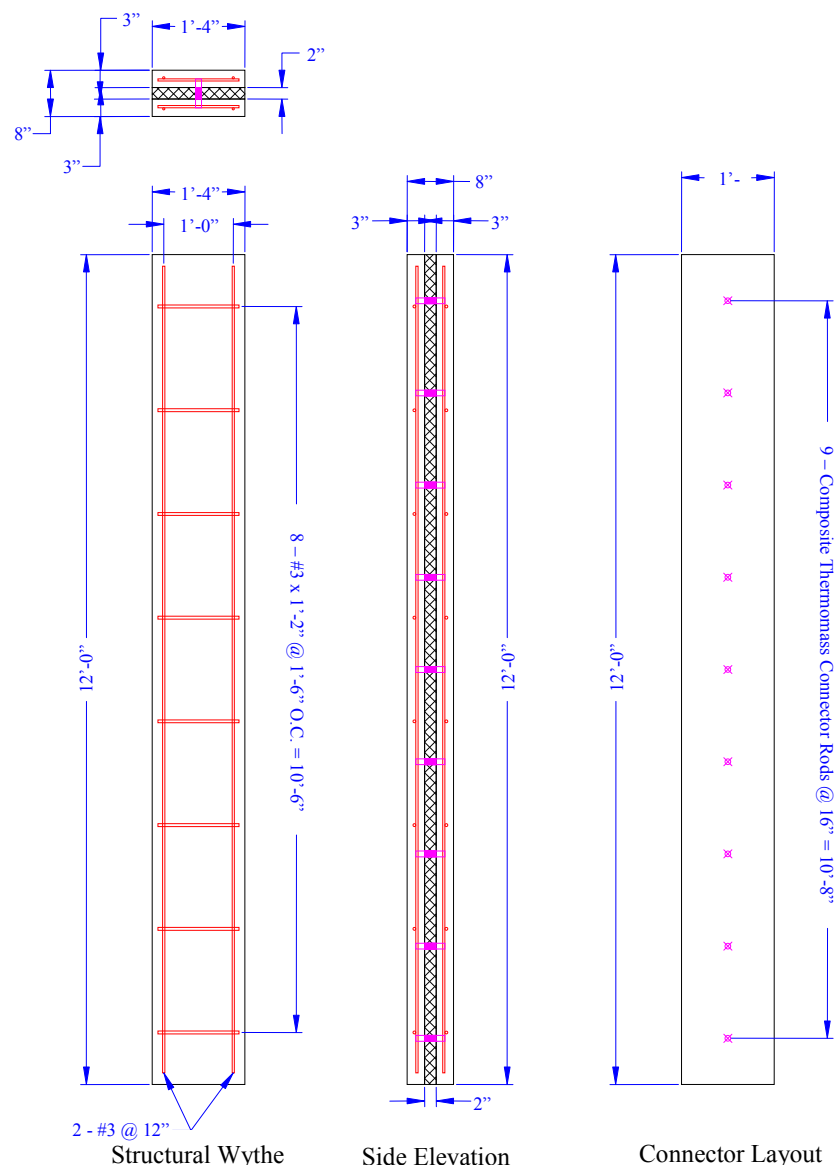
Conventionally Reinforced 3-2-3 Static Sandwich Panel Specimen
